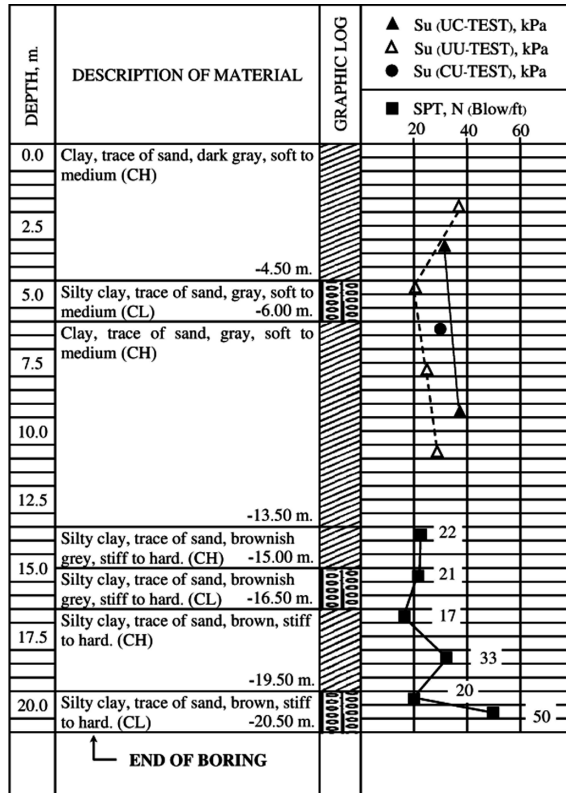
Profile of foundation soils at test site and relevant strength parameters.
